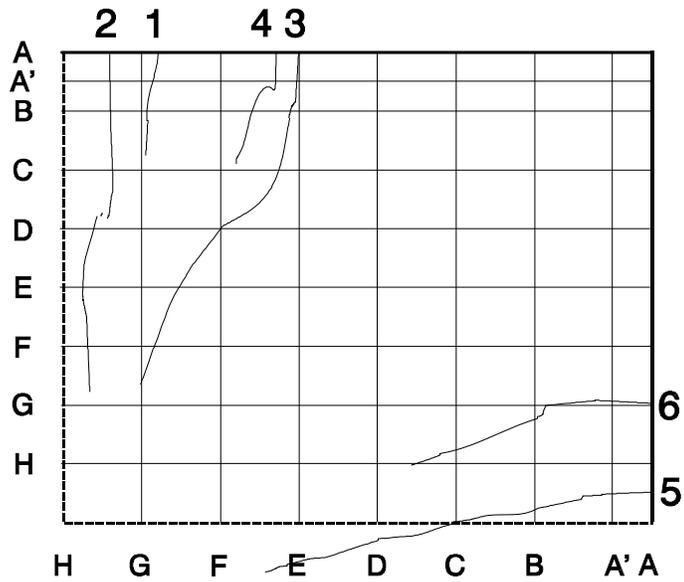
POJ-PU-54-TH cracking pattern on south face of joint at service load
